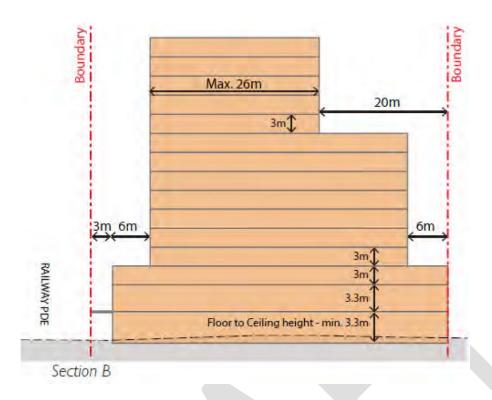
North-South Section of Site Building Envelope
